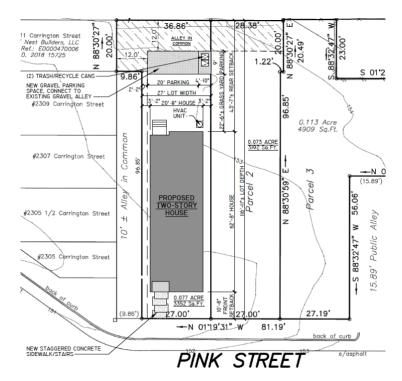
Plan of proposed parcel layout and proposed dwelling along Pink Street
